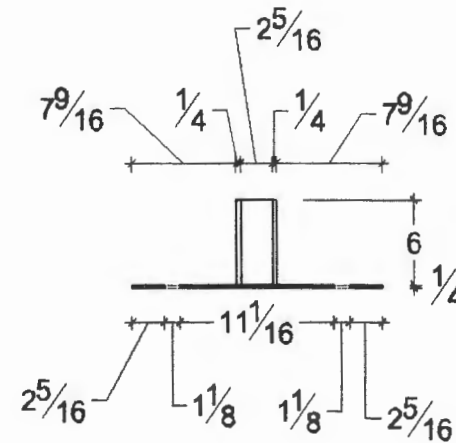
DETAIL OF PIER THROUGH-BOLTED TO "FOOTING PLATE ANCHOR- NTS
